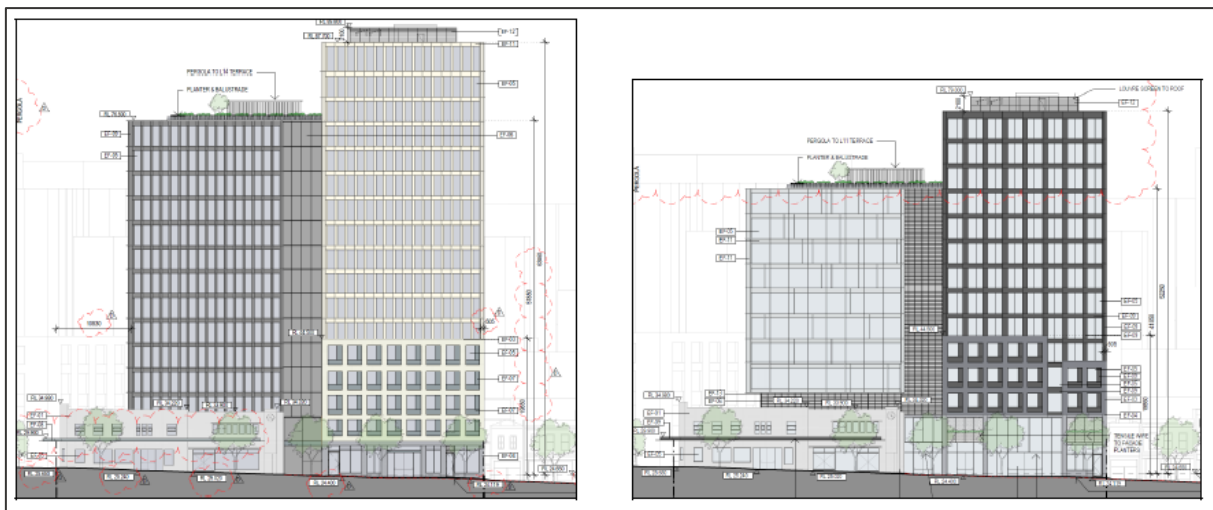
Elizabeth Street (west) Elevation - Application Plans (left) Discussion Plans (right)
